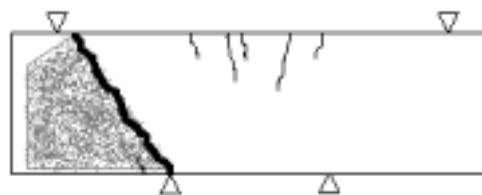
Typical failure modes for Owens Corning/Reichhold beams reinforced for flexure plus shear at 90 degrees.
